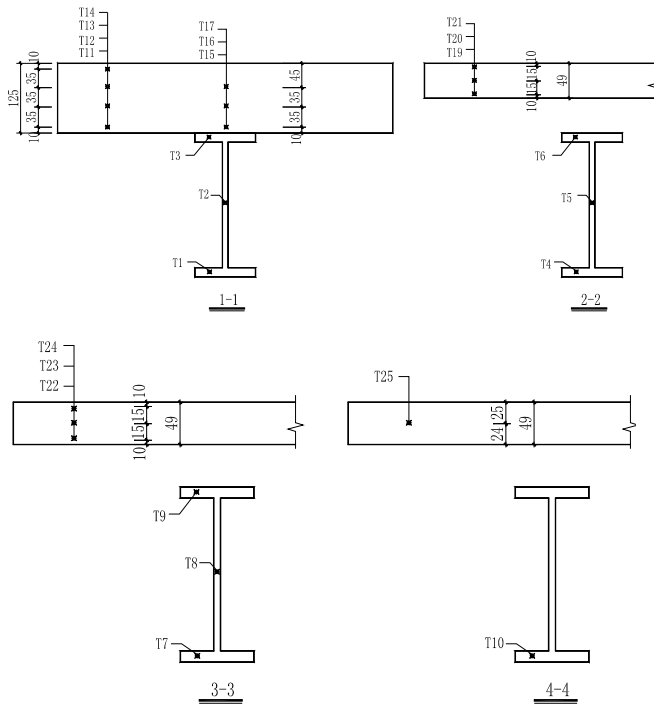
Positions of thermal couples over cross-section of specimen CB125 (mm)
